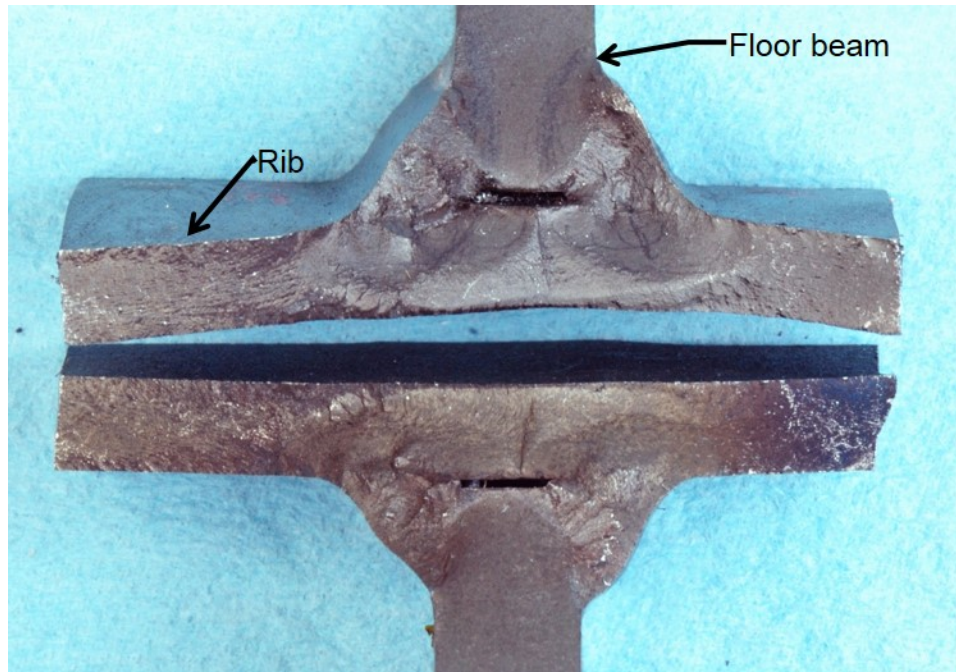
Mating fatigue fracture surfaces for the crack to the north of rib in MU2
